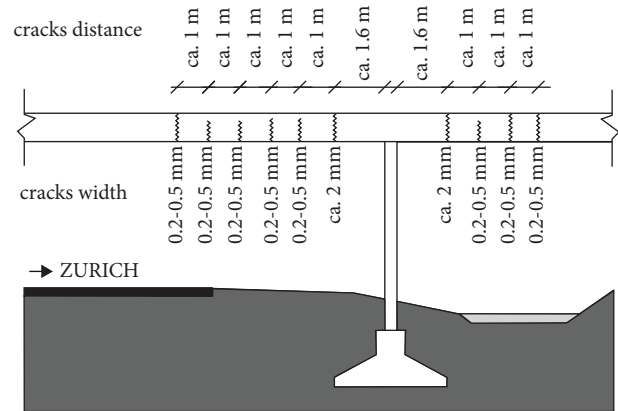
Cracks in the bridge girder after lowering the pier at 44 m.
